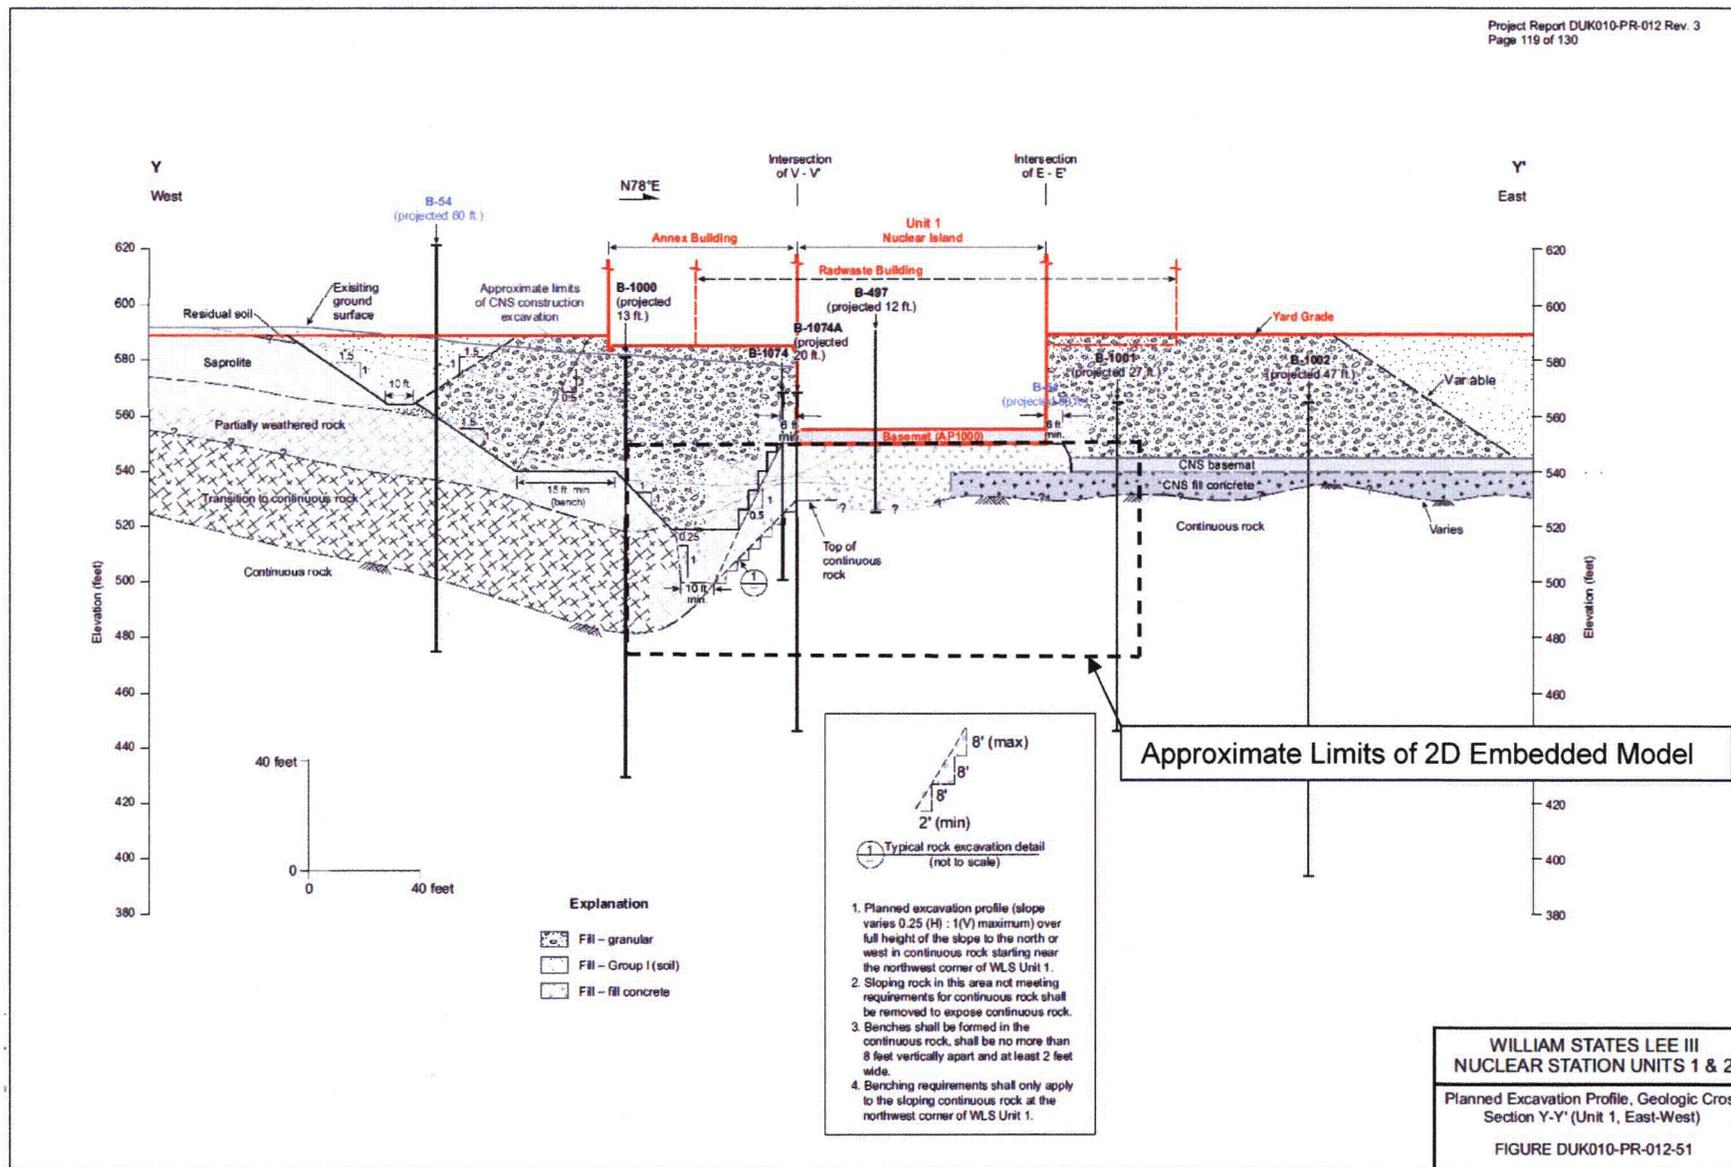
Cross-Section Y-Y (Unit 1, East-West)
